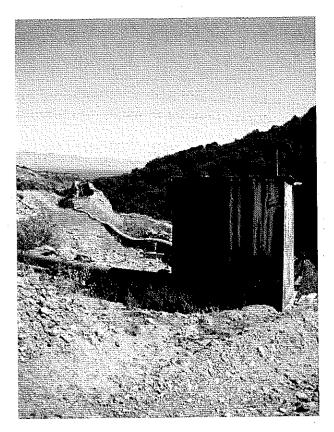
View of piping diverting water from the quarry pit to Pond 4 in the distance.
